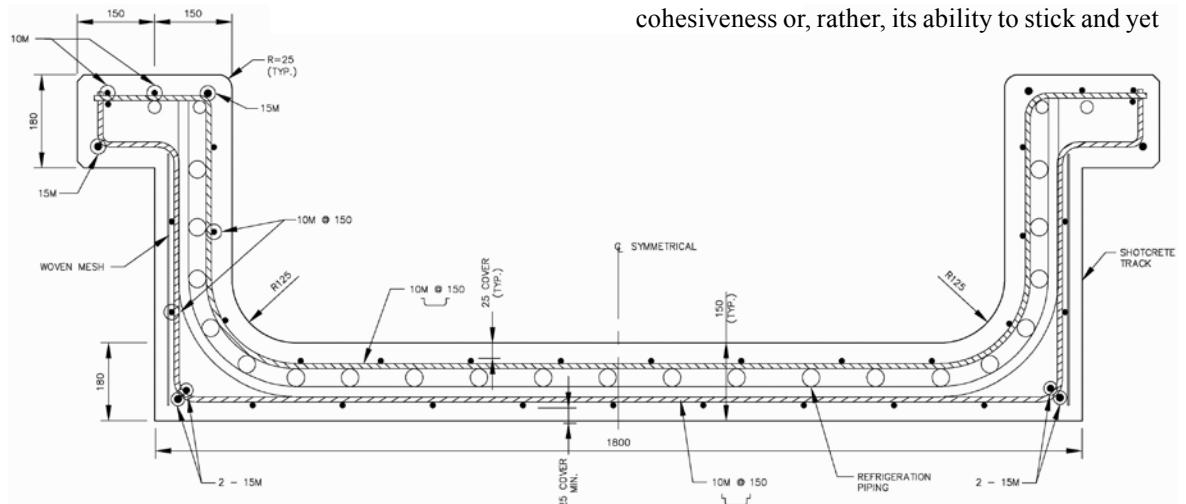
Typical track reinforcing at straight section (not to scale)
